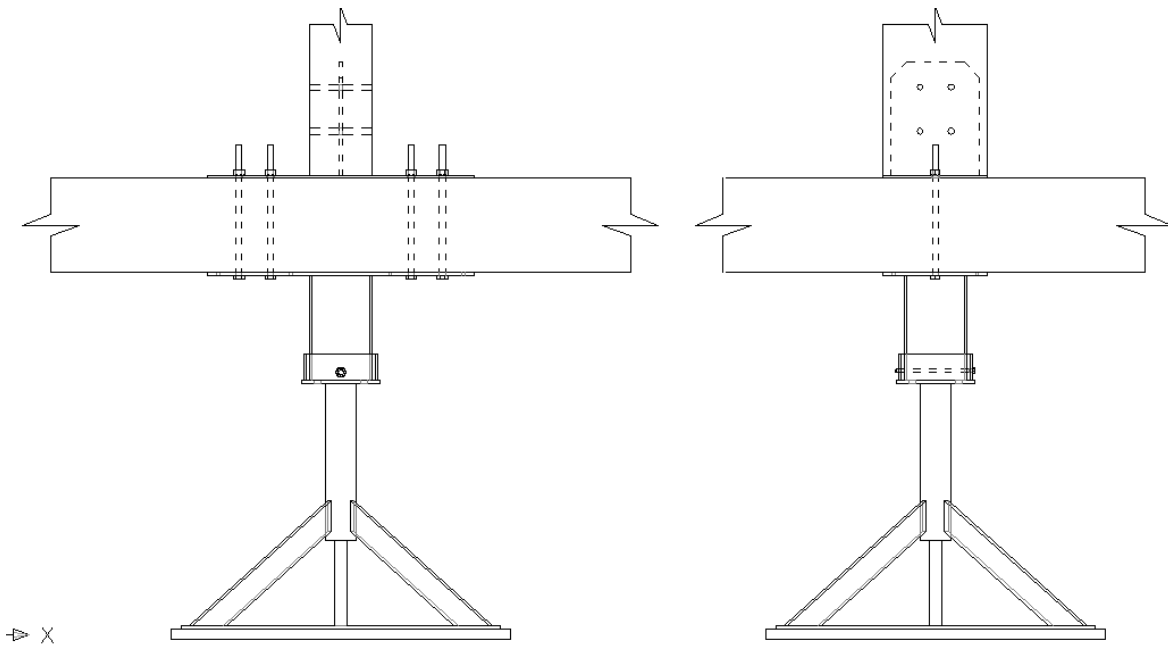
Display of connections between wooden column, wooden slab, steel foundation pier and foundations
